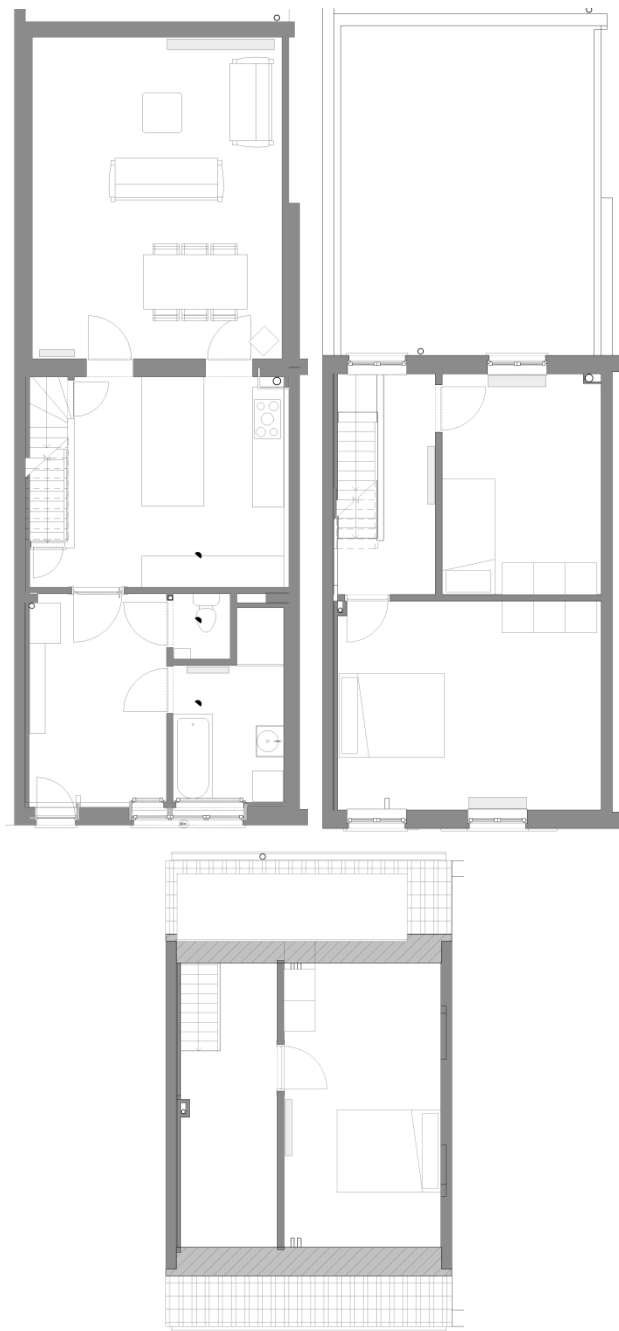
terraced case-study , adapted for simulation (with added partition walls and doors between the originally open kitchen and the living area and stair well) (top: ground floor and 1st floor, bottom: 2nd floor) (copyright: BAST-architects & engineers)
